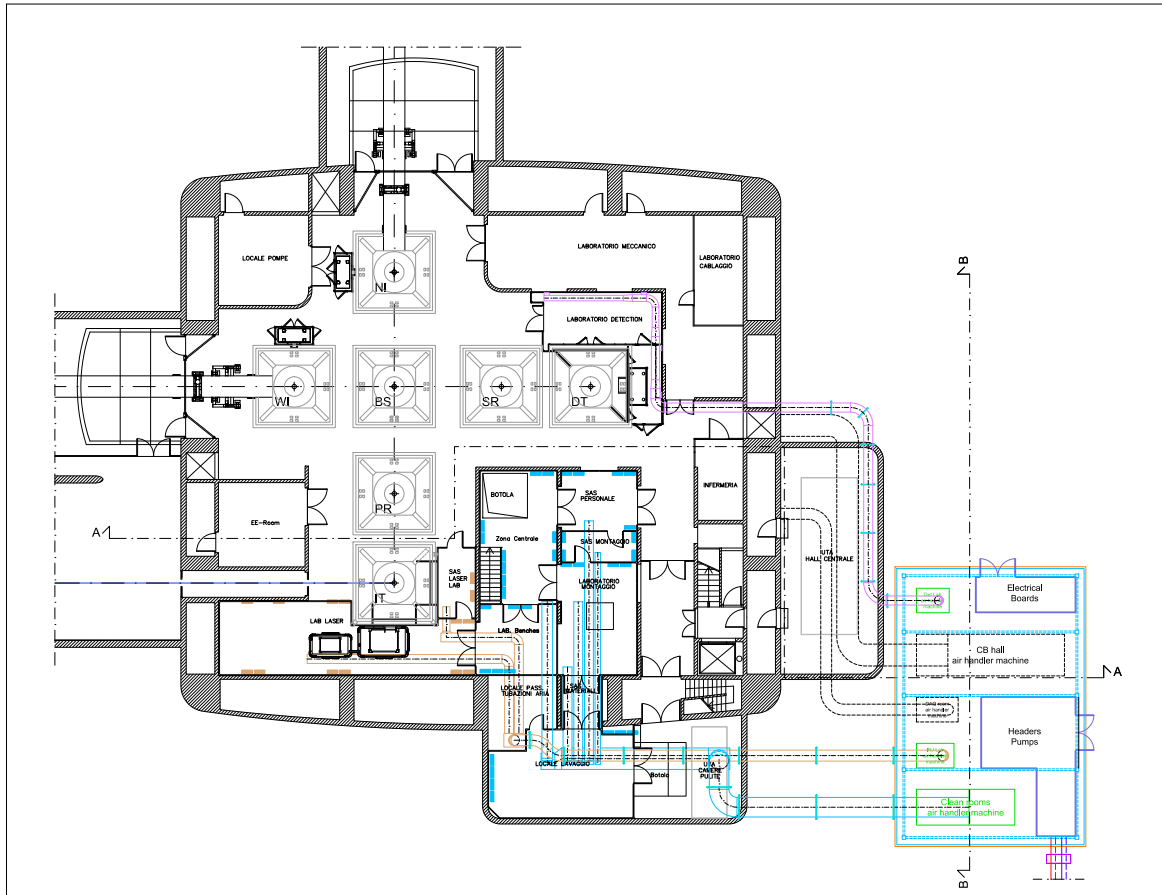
Clean rooms, INJ lab and DET lab HVAC systems; return air ducts.
